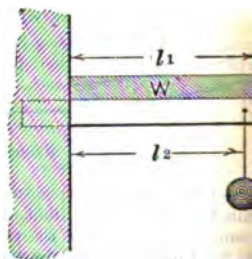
Cantilever Beam. Distributed Load and Load at Free End
